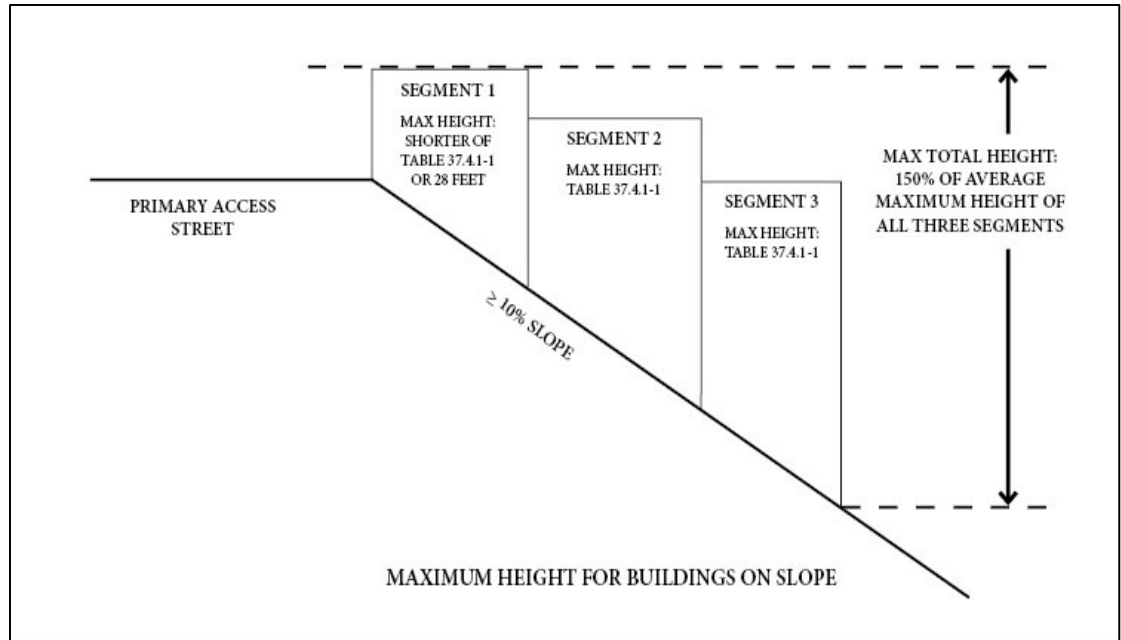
A: Maximum Height for Buildings on Slope
